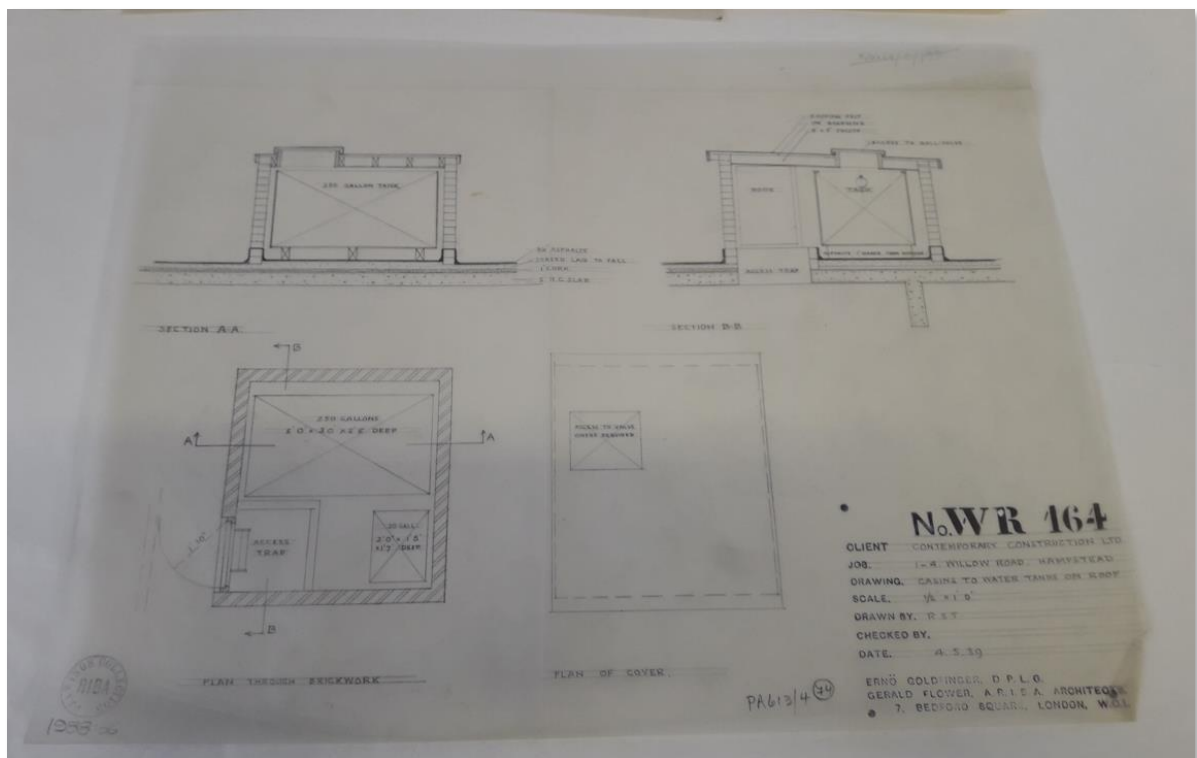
Goldfinger casing to water tank on roof drawing showing roof construction dated 1939
